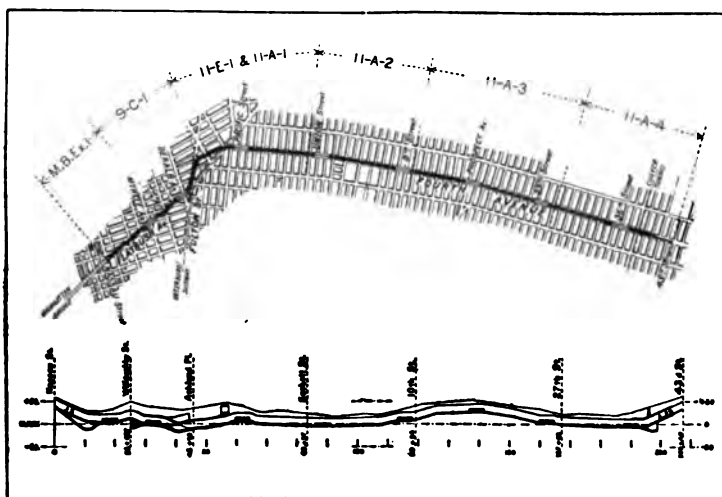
PLAN OF FOURTH AVENUE SUBWAY, BROOKLYN, N. Y.
